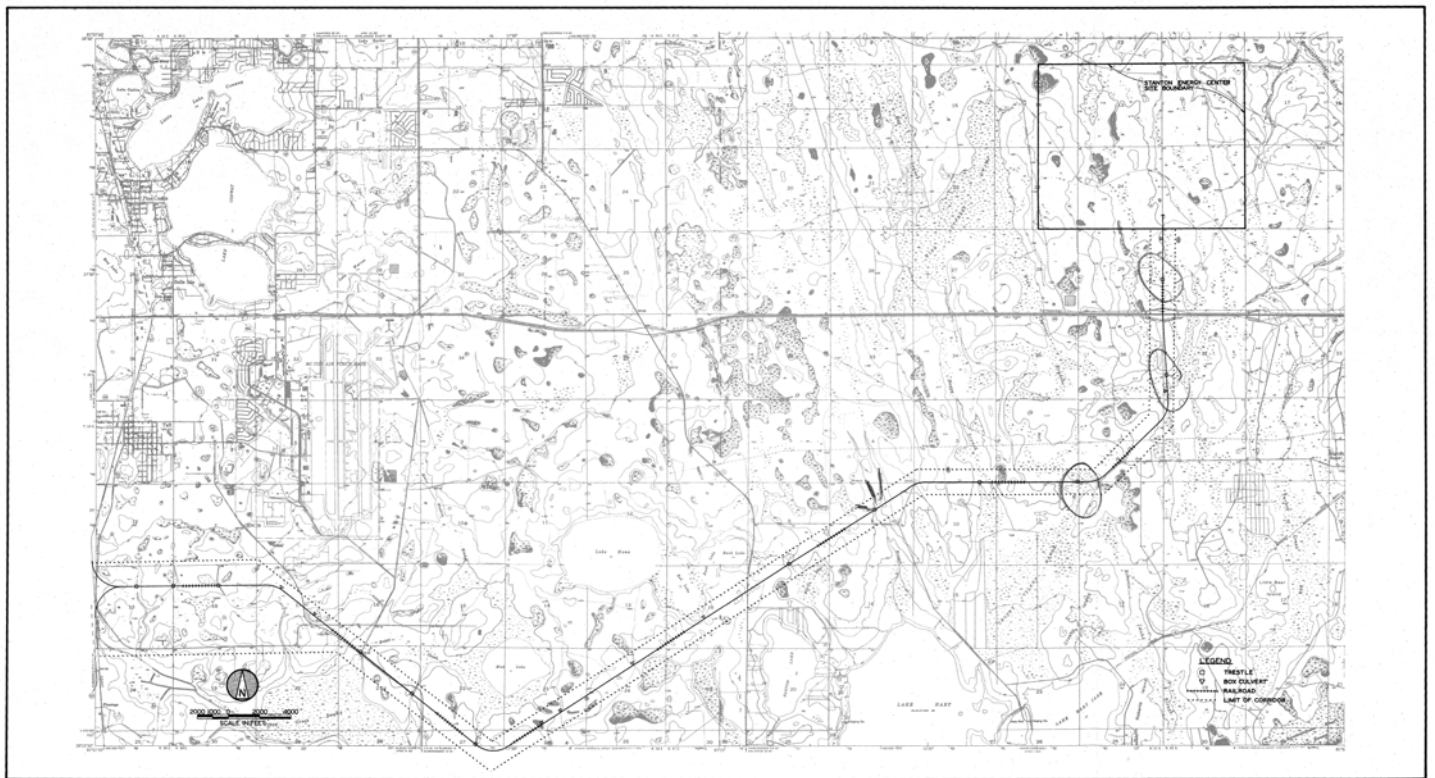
ROUTING OF RAILROAD TO SITE
